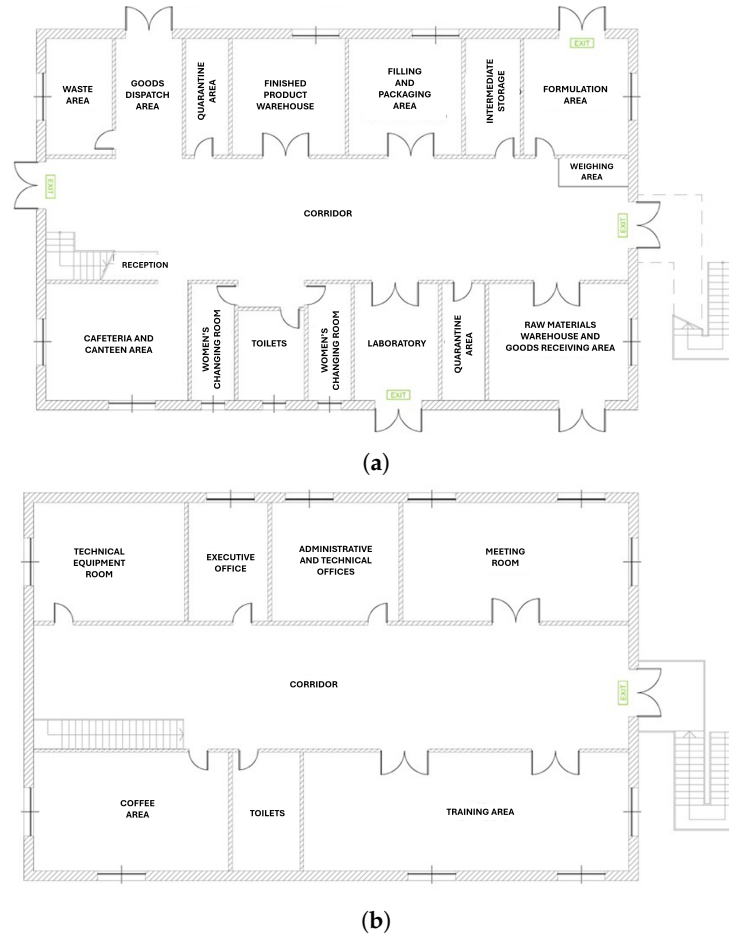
Layout of the industrial plant. (a) Ground floor; (b) first floor.
